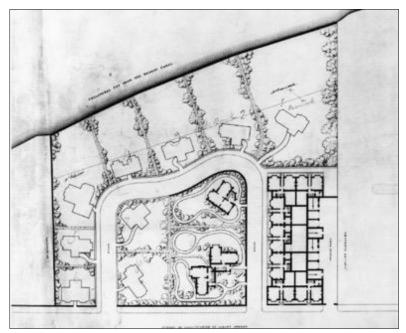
Detail original Plan of Park Village West held in Public Record Office, 1831 (National Archive ref: MPE 1/1284)
